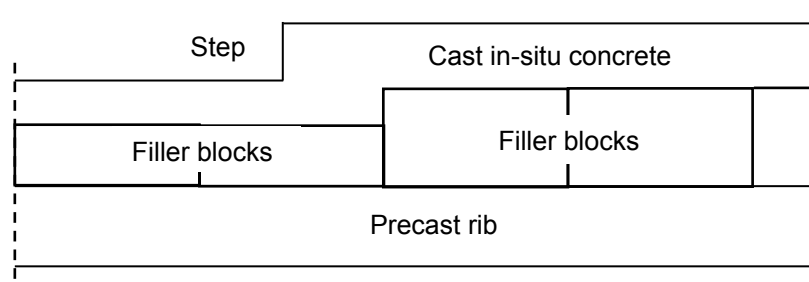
Step at the top of a beam and block slab system (perpendicular to ribs)
